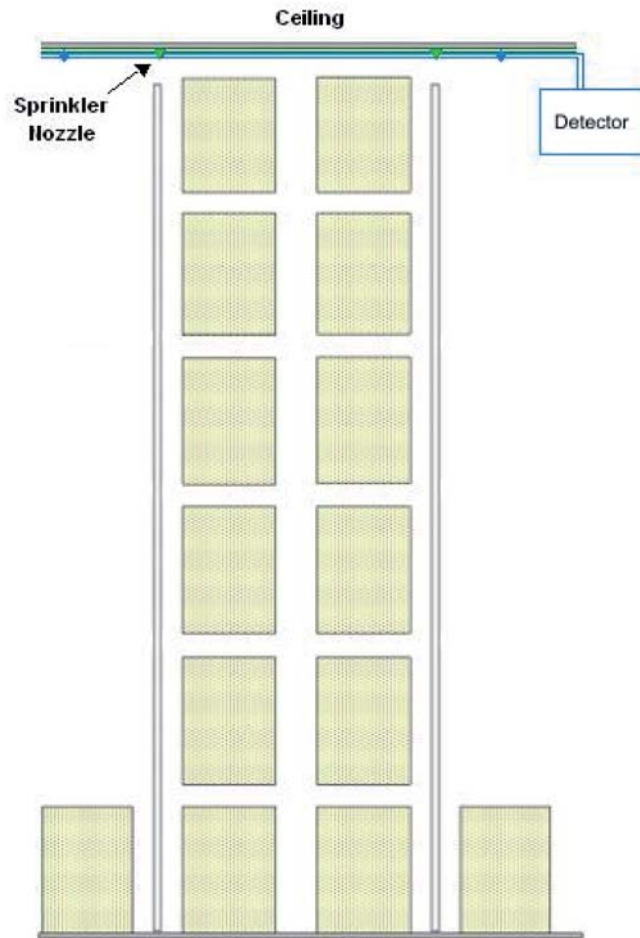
Arrangement of the System Sensor sampling pipe network and sprinkler heads on the ceiling.
